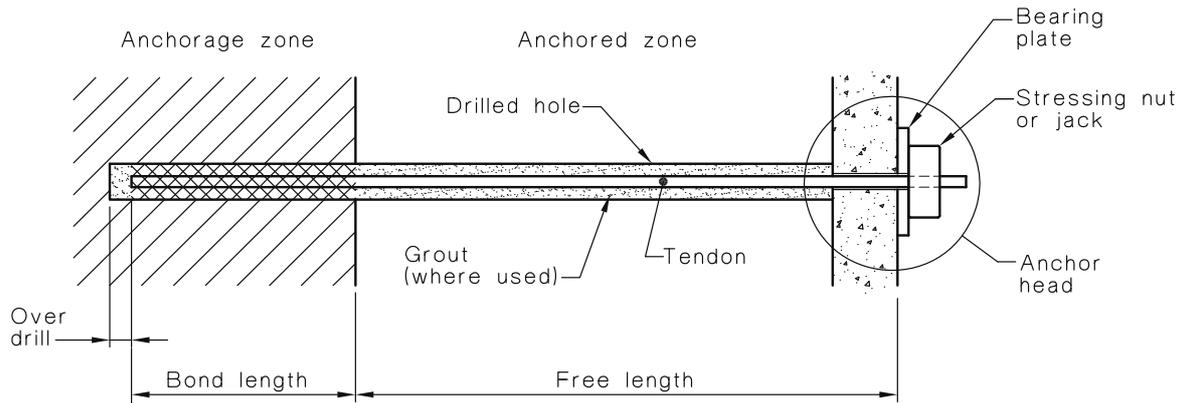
GROUND ANCHOR TERMINOLOGY (GROUTED ANCHORAGE)
